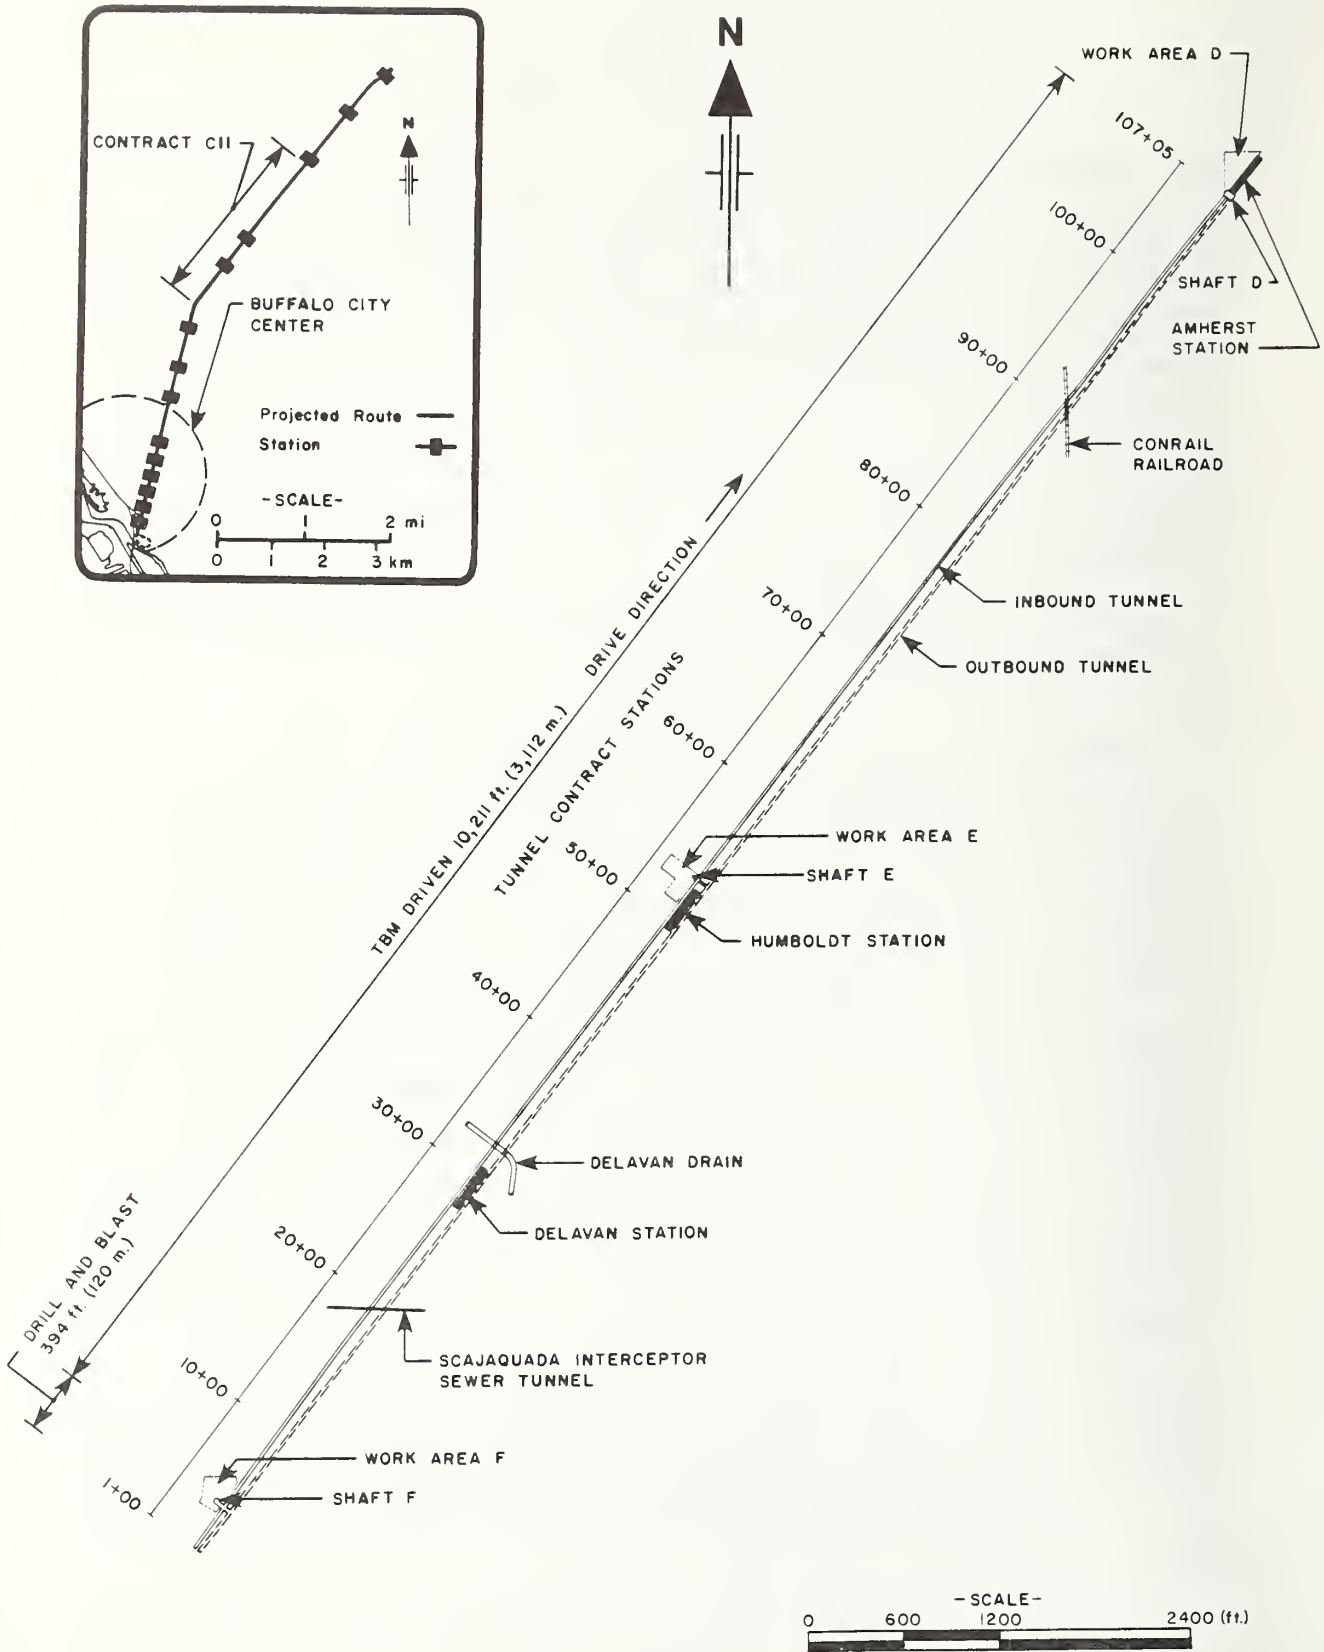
PLAN VIEW OF CONTRACT C11, INBOUND TUNNEL
